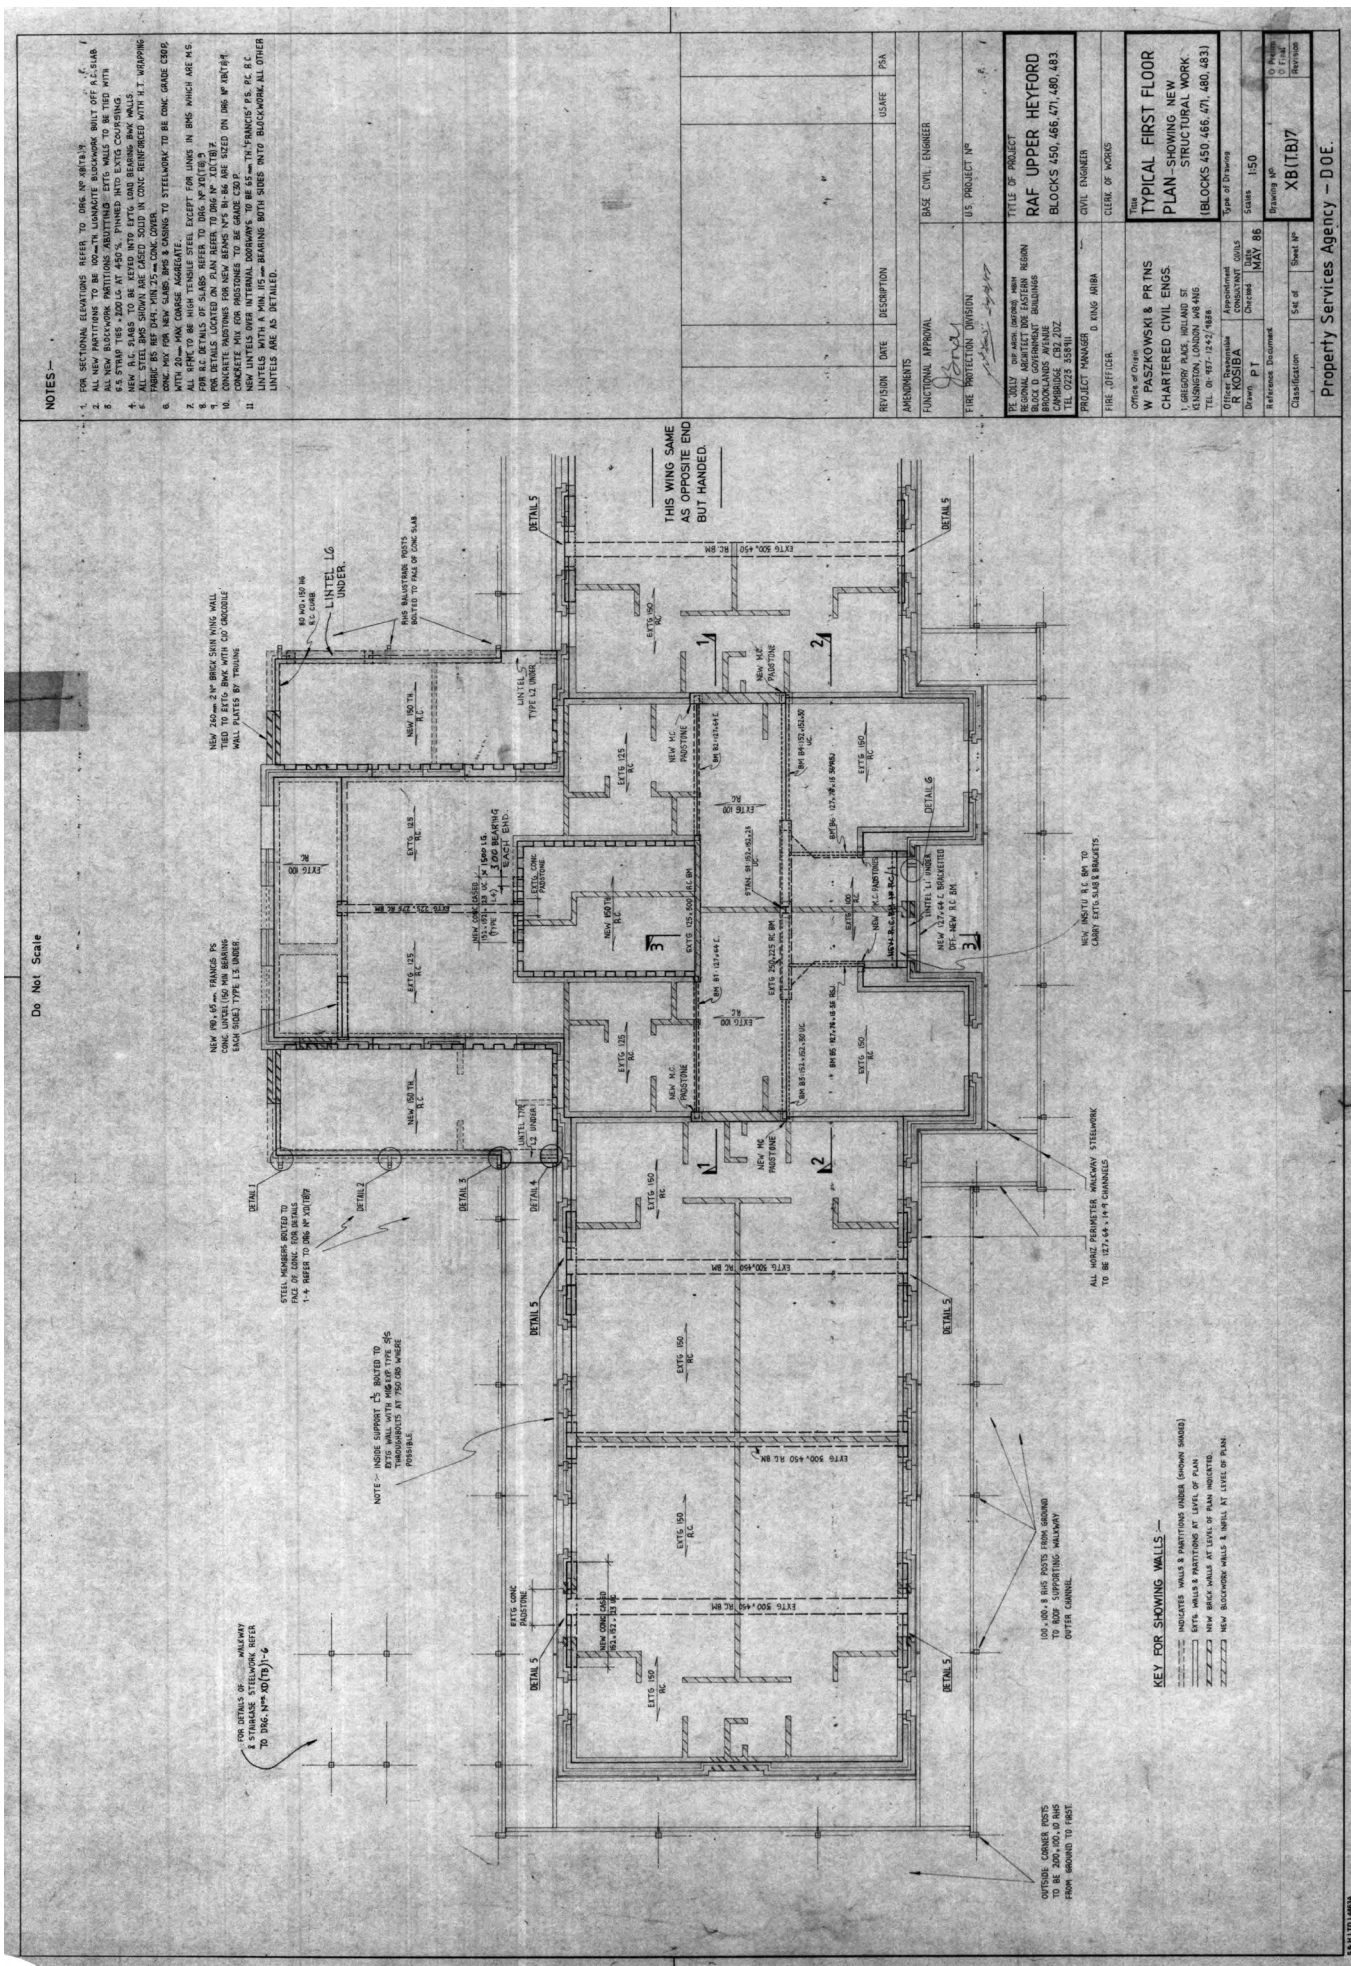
, 466, 471, 480, 483.2 C Type Barracks first floor
